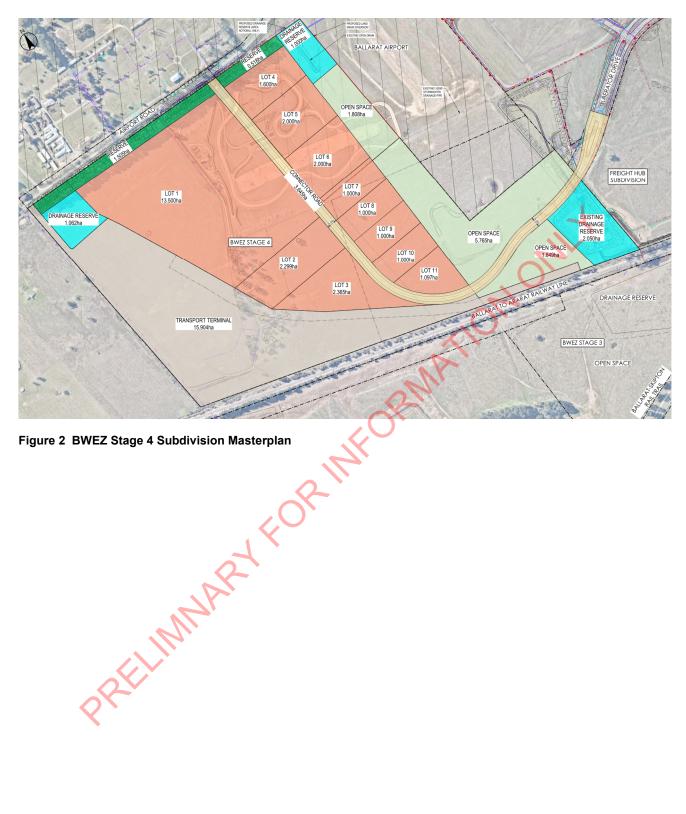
BWEZ Stage 4 Subdivision Masterplan
